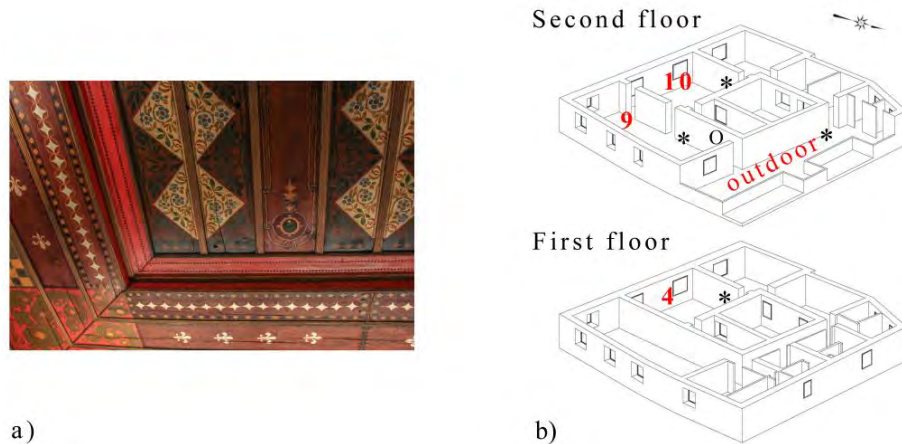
a) An example of wooden panels with cracks and deformations at the second floor. b) The axonometric cross section of first and second floor of the Museum. Numbers individuate the rooms where sensors were installed: ‘*’ for T and RH and ‘o’ for T_s and C.
